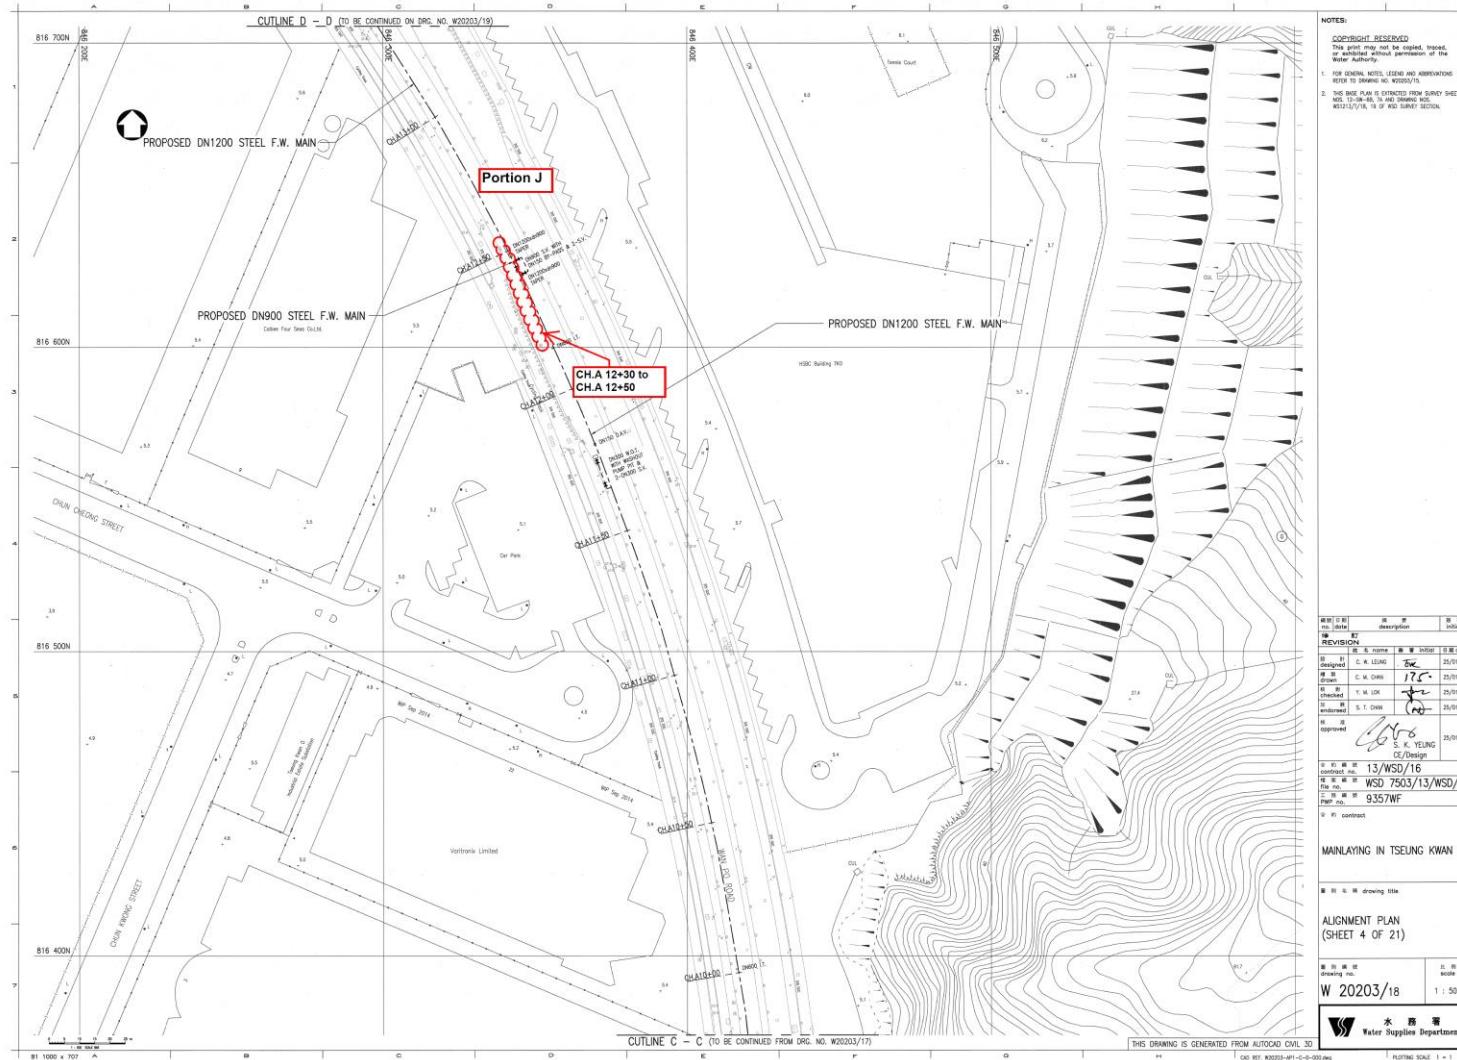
Location Plan for Portion J - CH.A 12+30 to CH.A 12+50
